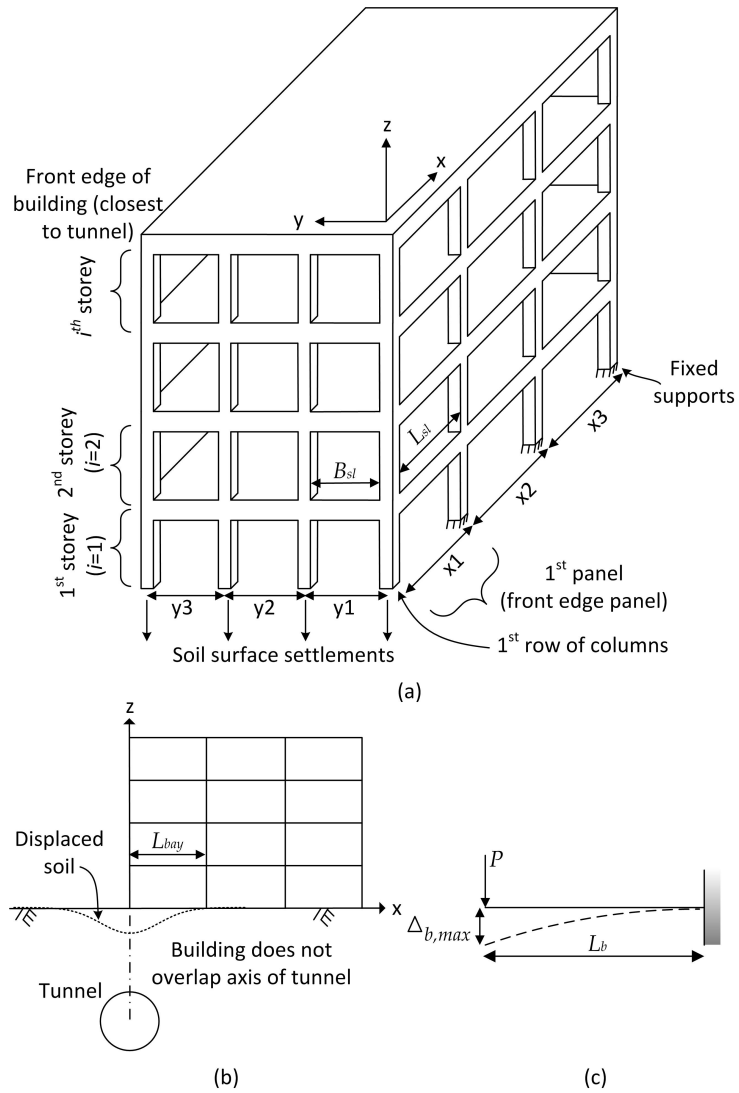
(a) Isometric view of framed building, (b) 2D view of building and tunnel, and (c) cantilever beam
